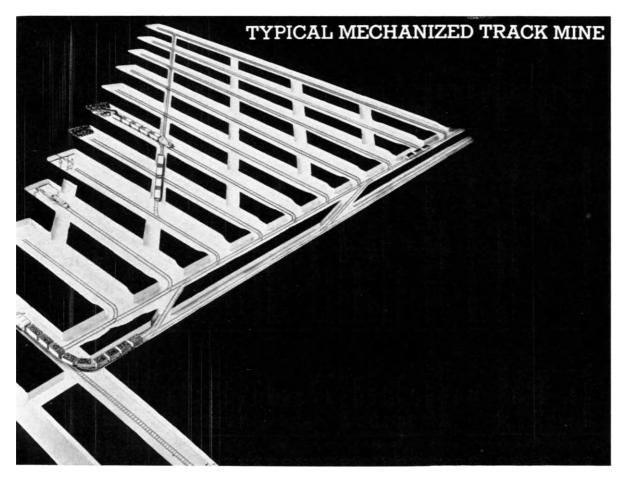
Typical mechanized track mine. (Joy Manufacturing Company.)
